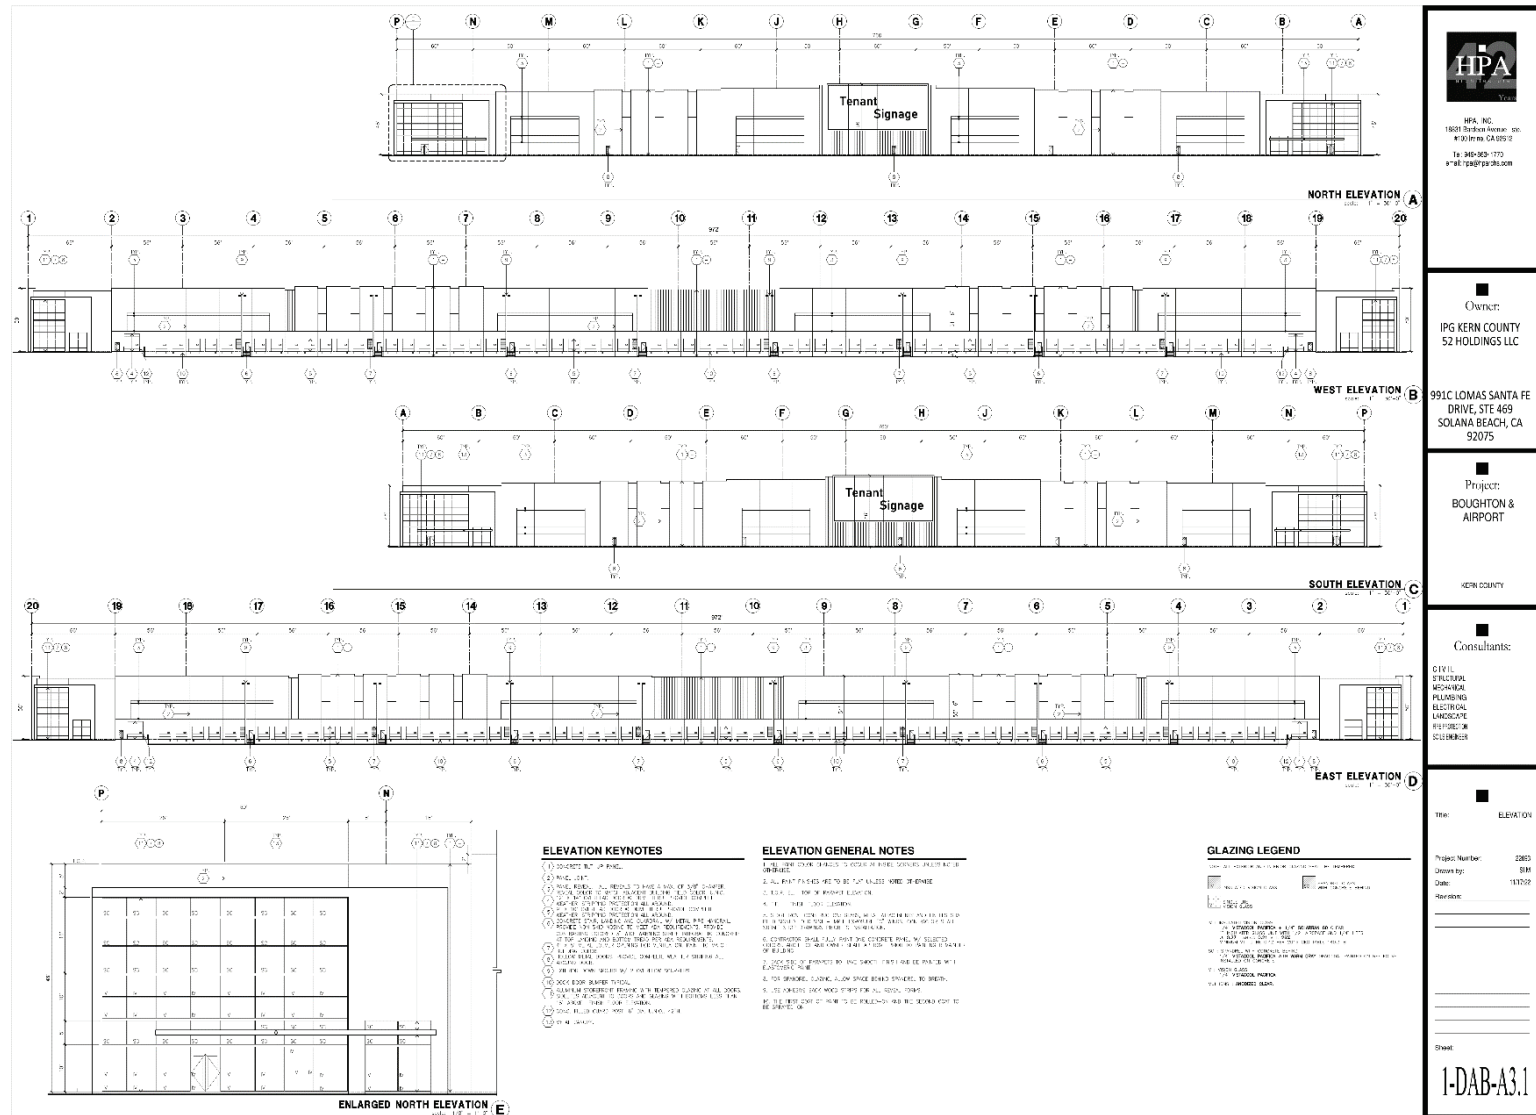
Precise Development Plan - Building 2 Engineered Elevations
